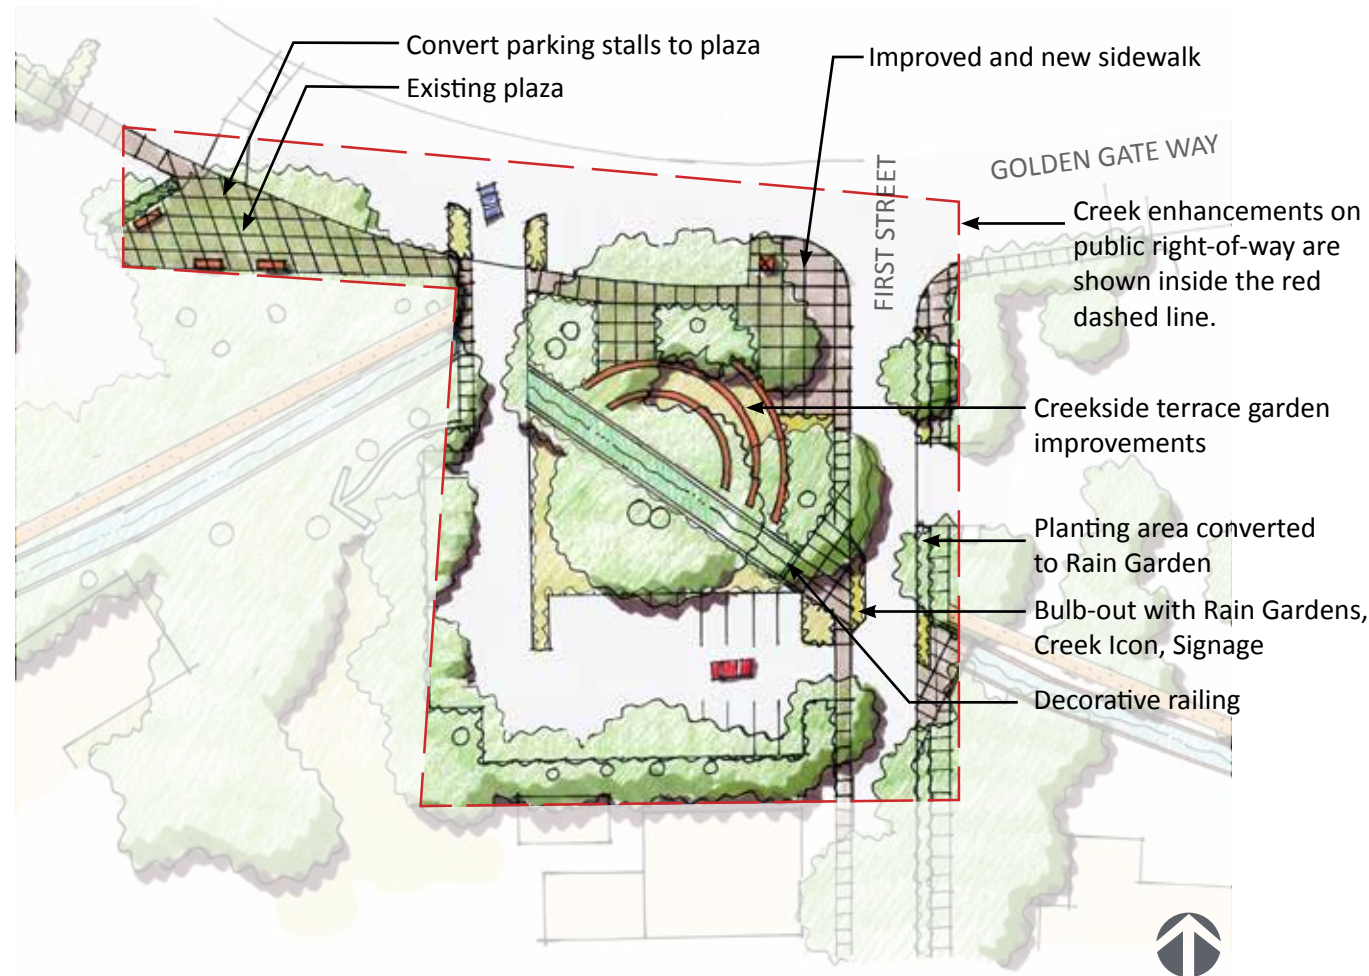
Plan View - First Street creek crossing with rain gardens and creek icons, terrace garden and plazas at Golden Gate Way
